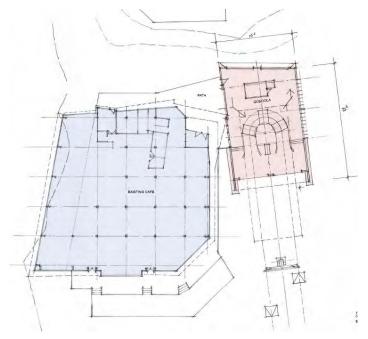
Floor plan of proposed gondola upper terminal (red) and the existing Knoll Ridge Café (grey)
